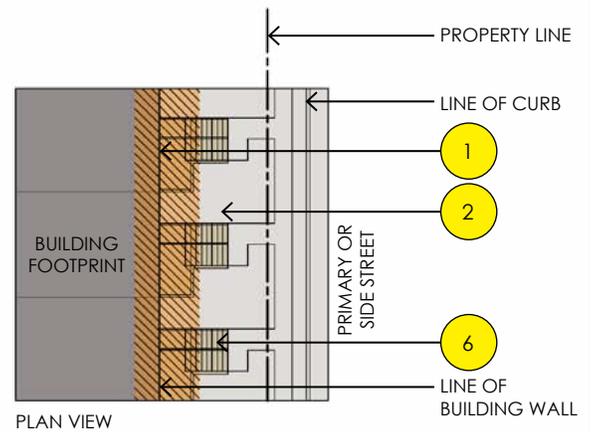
ROWHOUSE BUILDING WITH LIGHTWELL FRONTAGE
